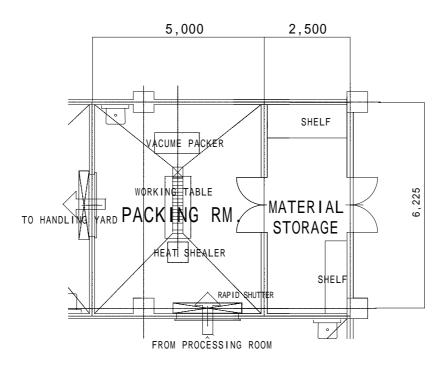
Layout of Packing Room/Packing Materials Storage
